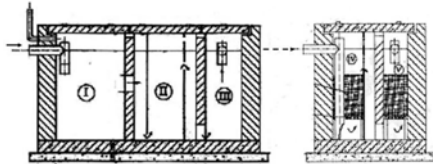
First full-scale BASTAF P-01 installed in Hanoi: a) plan view ; b) cross-section view.
